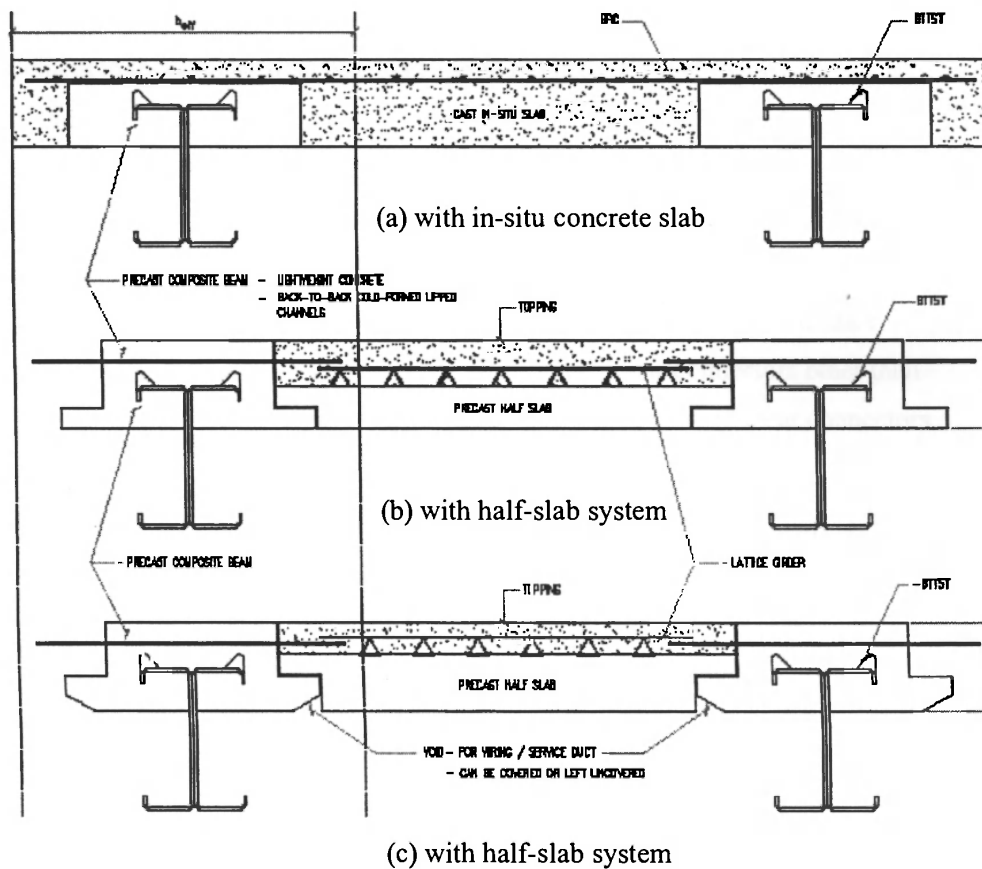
New types of cold-formed beams embedded in precast plank incorporation with floor system.
